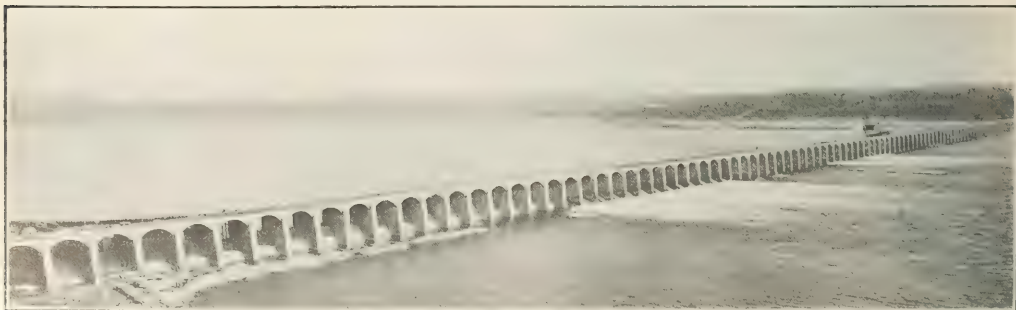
THE MONOLITHIC CONCRETE DAM, 4278 FT. LONG
